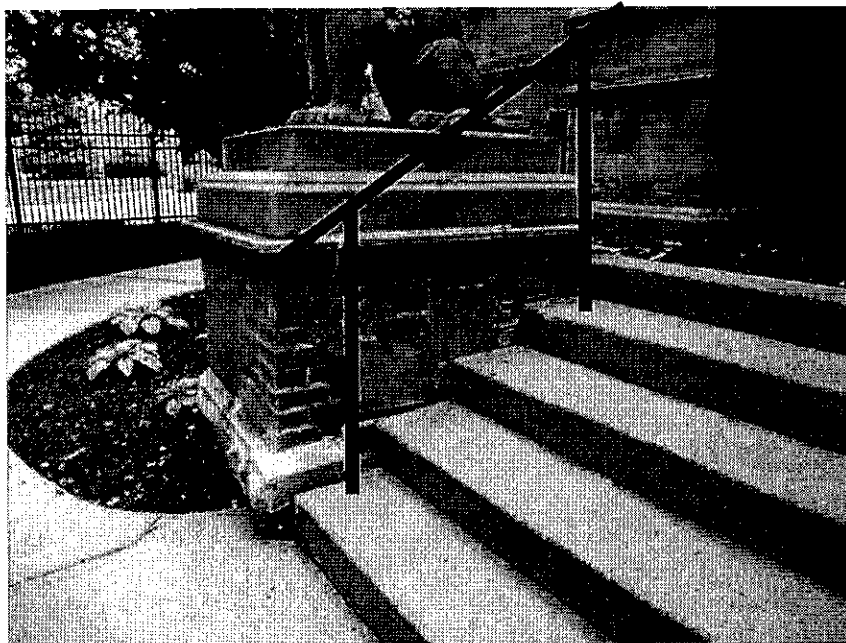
Diagram of the proposed east railing posts and railing location. The posts will be drilled into the concrete, set into stainless steel sleeves.
